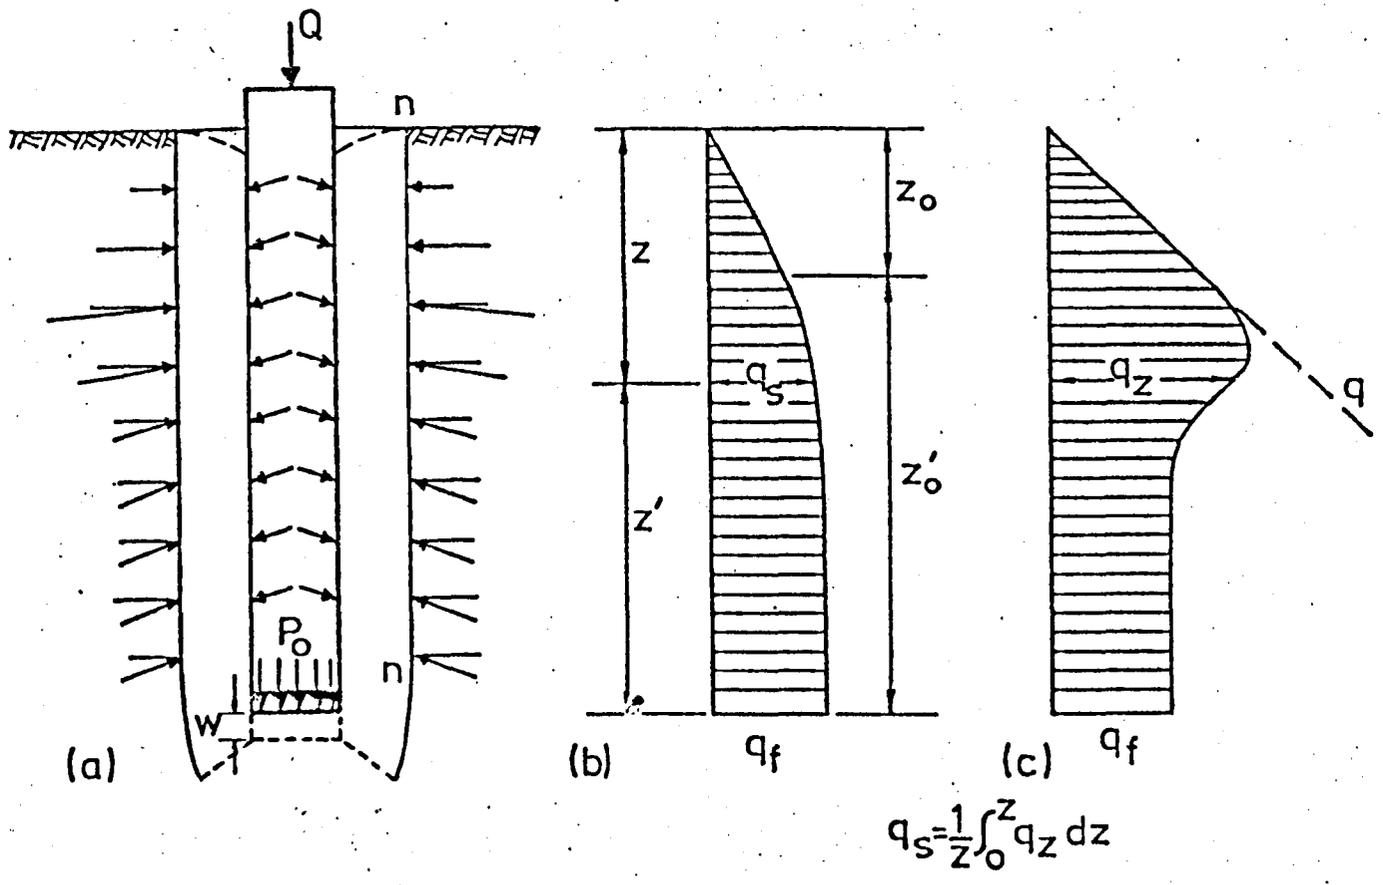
STRESS DISTRIBUTION AROUND A DEEP FOUNDATION IN SAND
